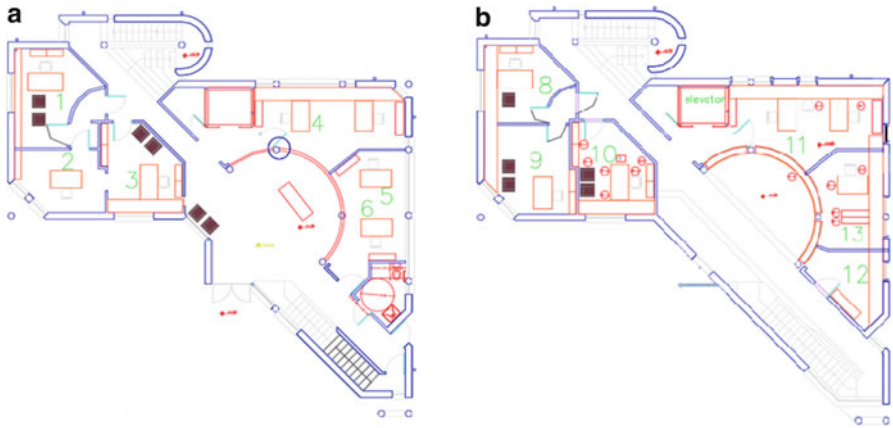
Floorplans for the (a) ground and (b) first floor of our smart building
